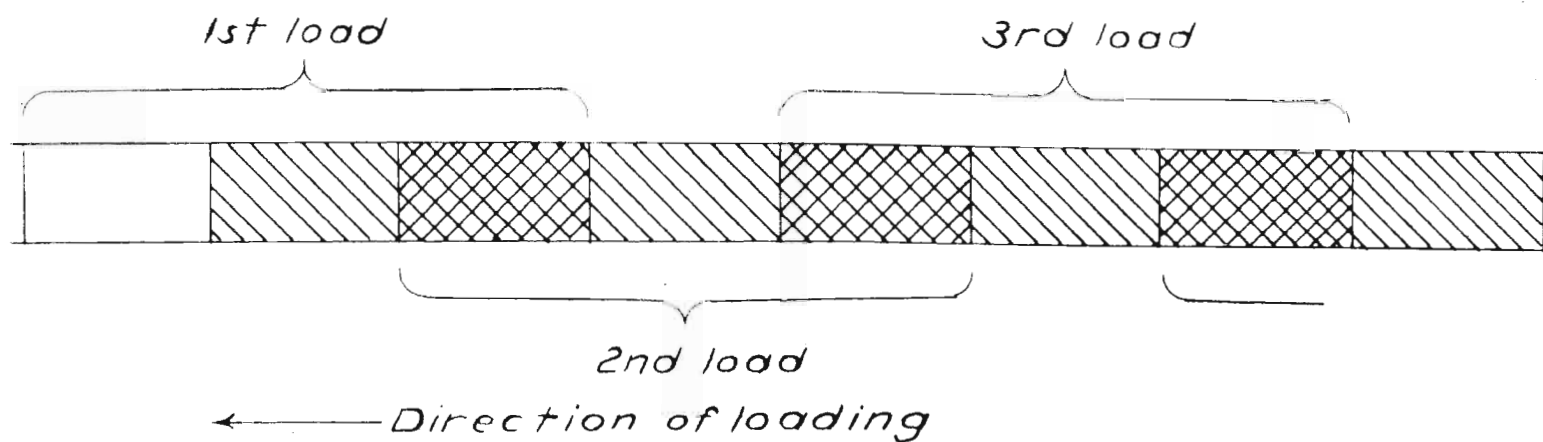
⁽⁴⁰⁾ Scraper loading procedure in a rooted area.
